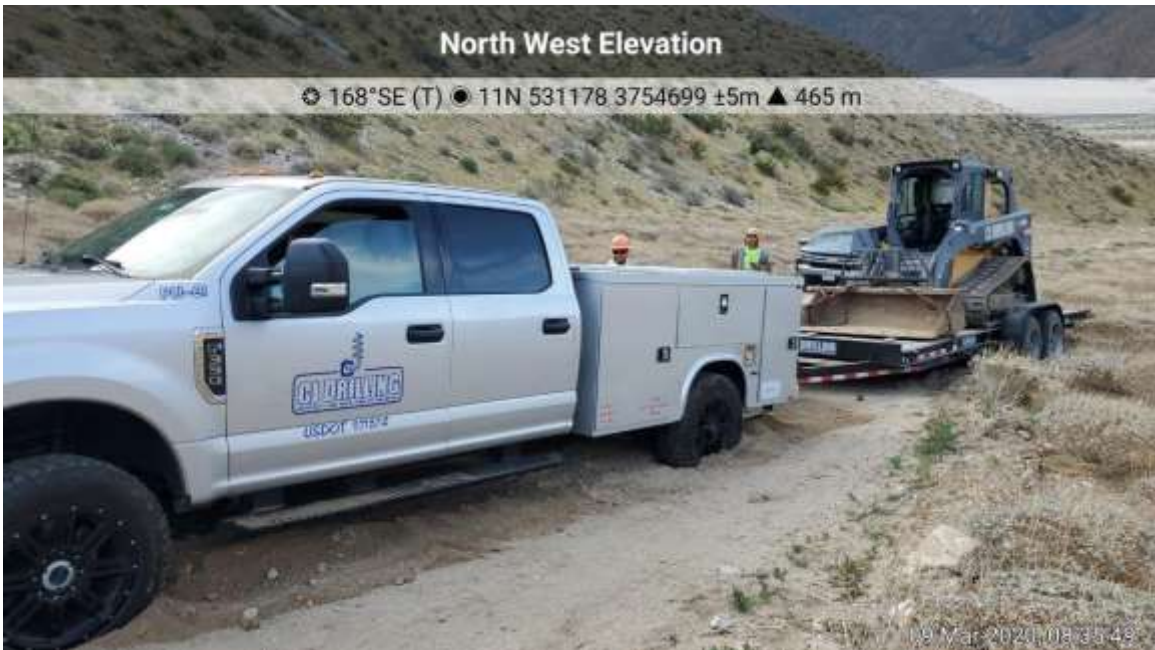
Vehicle and equipment outside approved work areas on access road to Construction Area 6N32, Segment 6 (March 9, 2020) (Photo courtesy of SCE).
